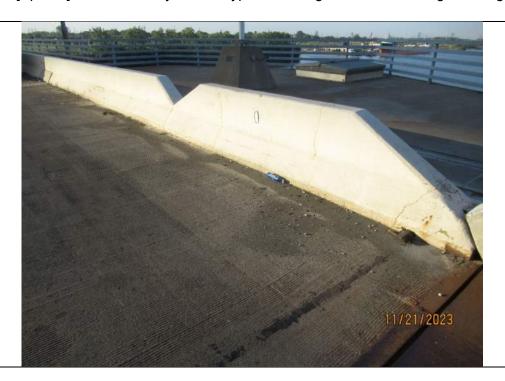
[Pier 4 Span] -West roadway barrier, typical vertical cracks, Looking Southwest
